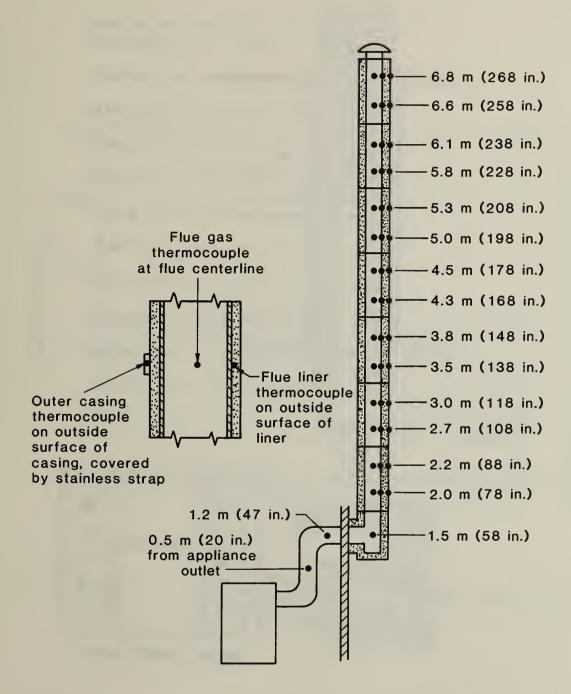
Instrumentation Locations for Tests of Factory Built Chimney 5.
